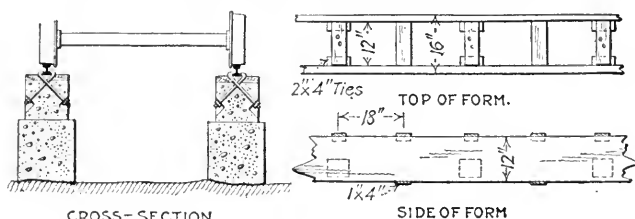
IMPROVED TYPE OF STRINGER AND FORM.
